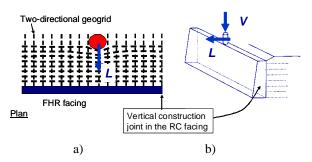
3-D resistance of FHR facing/geogrid system against lateral load acting to; a) a vertically long structure located inside the reinforced zone; and b) the top of the facing (Tatsuoka et al., 1997).
